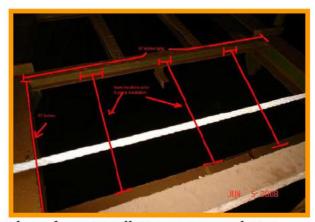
Showing Tank #20 Top Anchor I-Beam shortened and supported.
